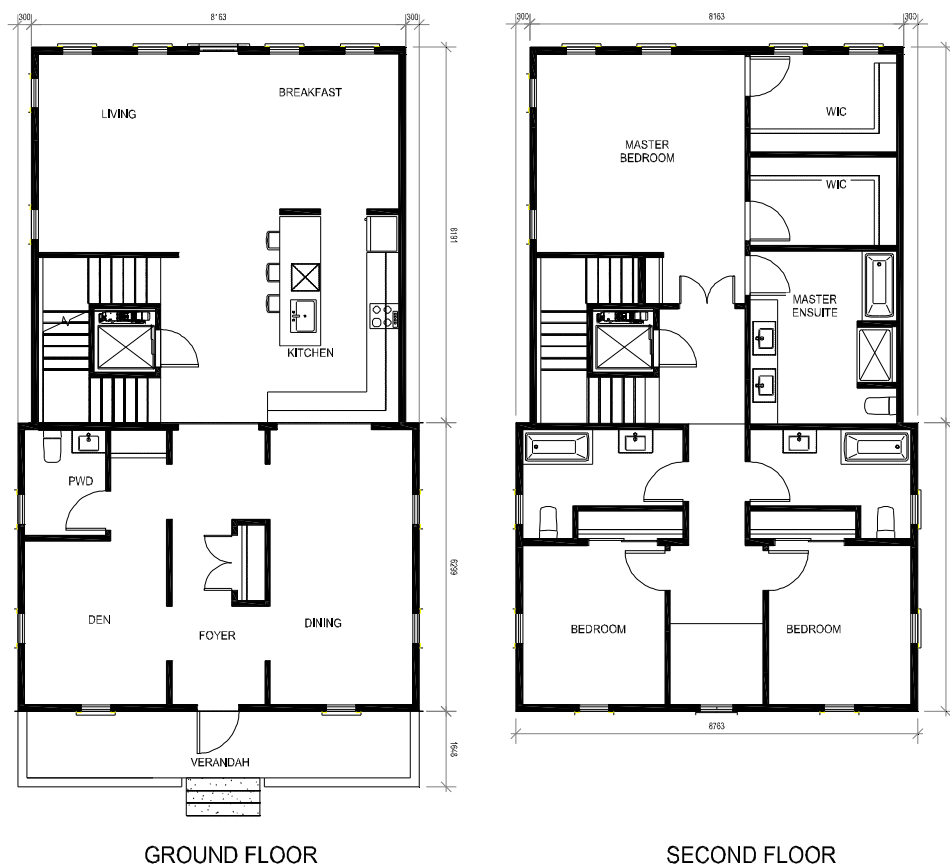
Proposed floor plans for No. 99 Nashville Road.
